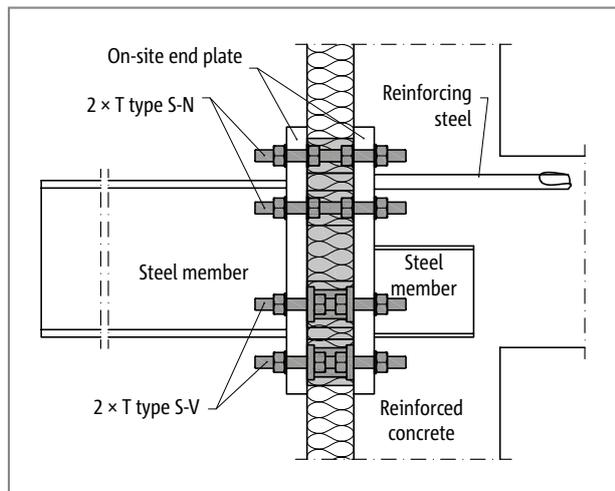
Schöck Isokorb® T type S-N and T type S-V: for connection of steel structures to reinforced concrete
